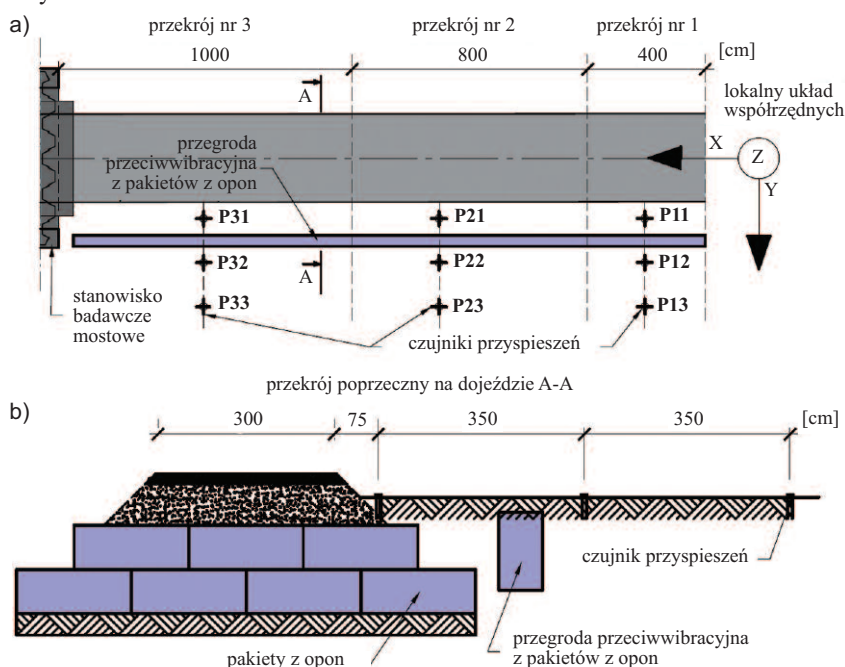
Scheme arrangement of measurement cross-sections (a) and acceleration sensors (b)
